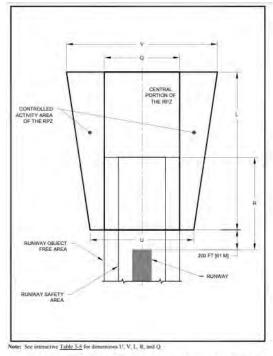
Runway Protection Zone (RPZ), Runway Object Free Area (ROFA) and Runway Safety Area (RSA)
